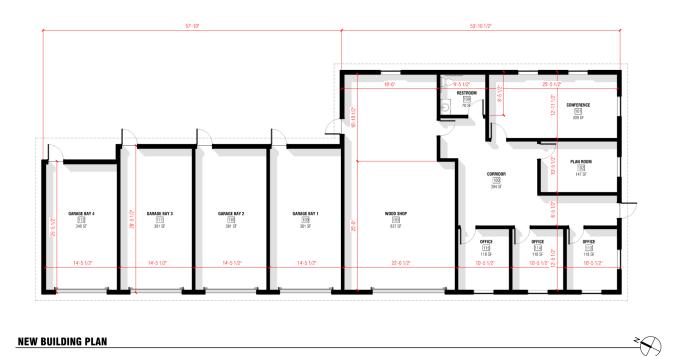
The floor plan above is representative of the progress that has been made in the development of a floor plan proposing a Facilities Office addition just to the north of the existing Grounds Shop connected by an open breezeway.
